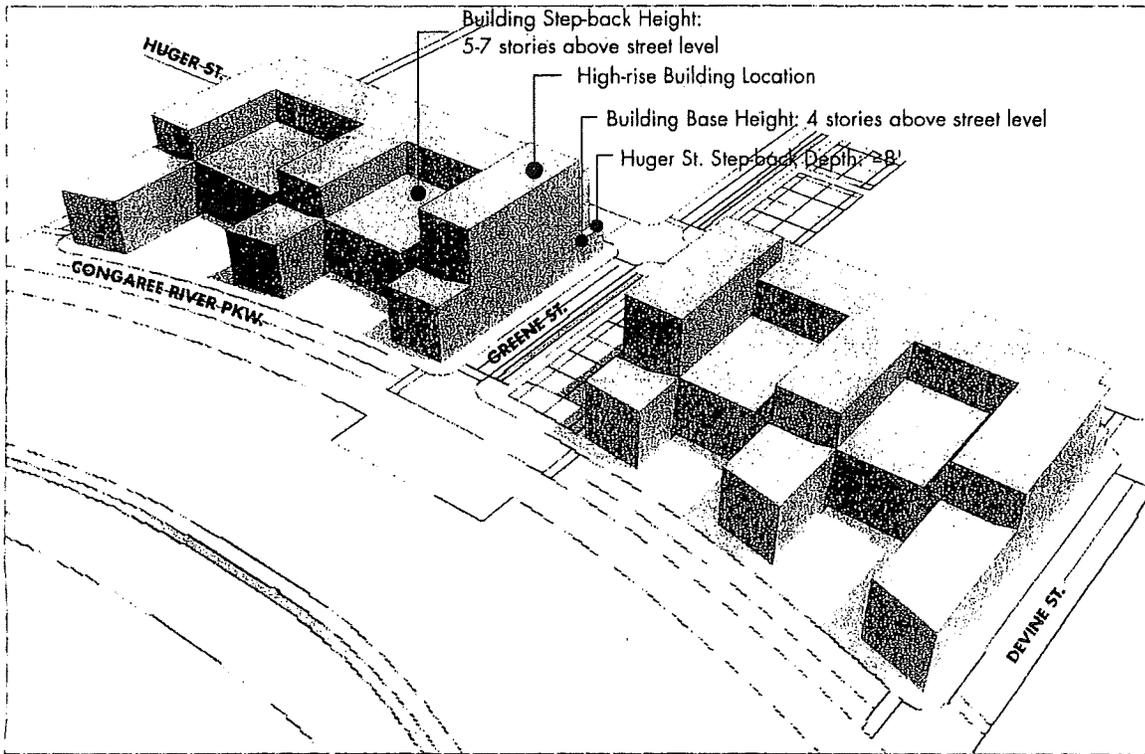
GREENE STREET OVERLOOK BUILDING ENVELOPE
